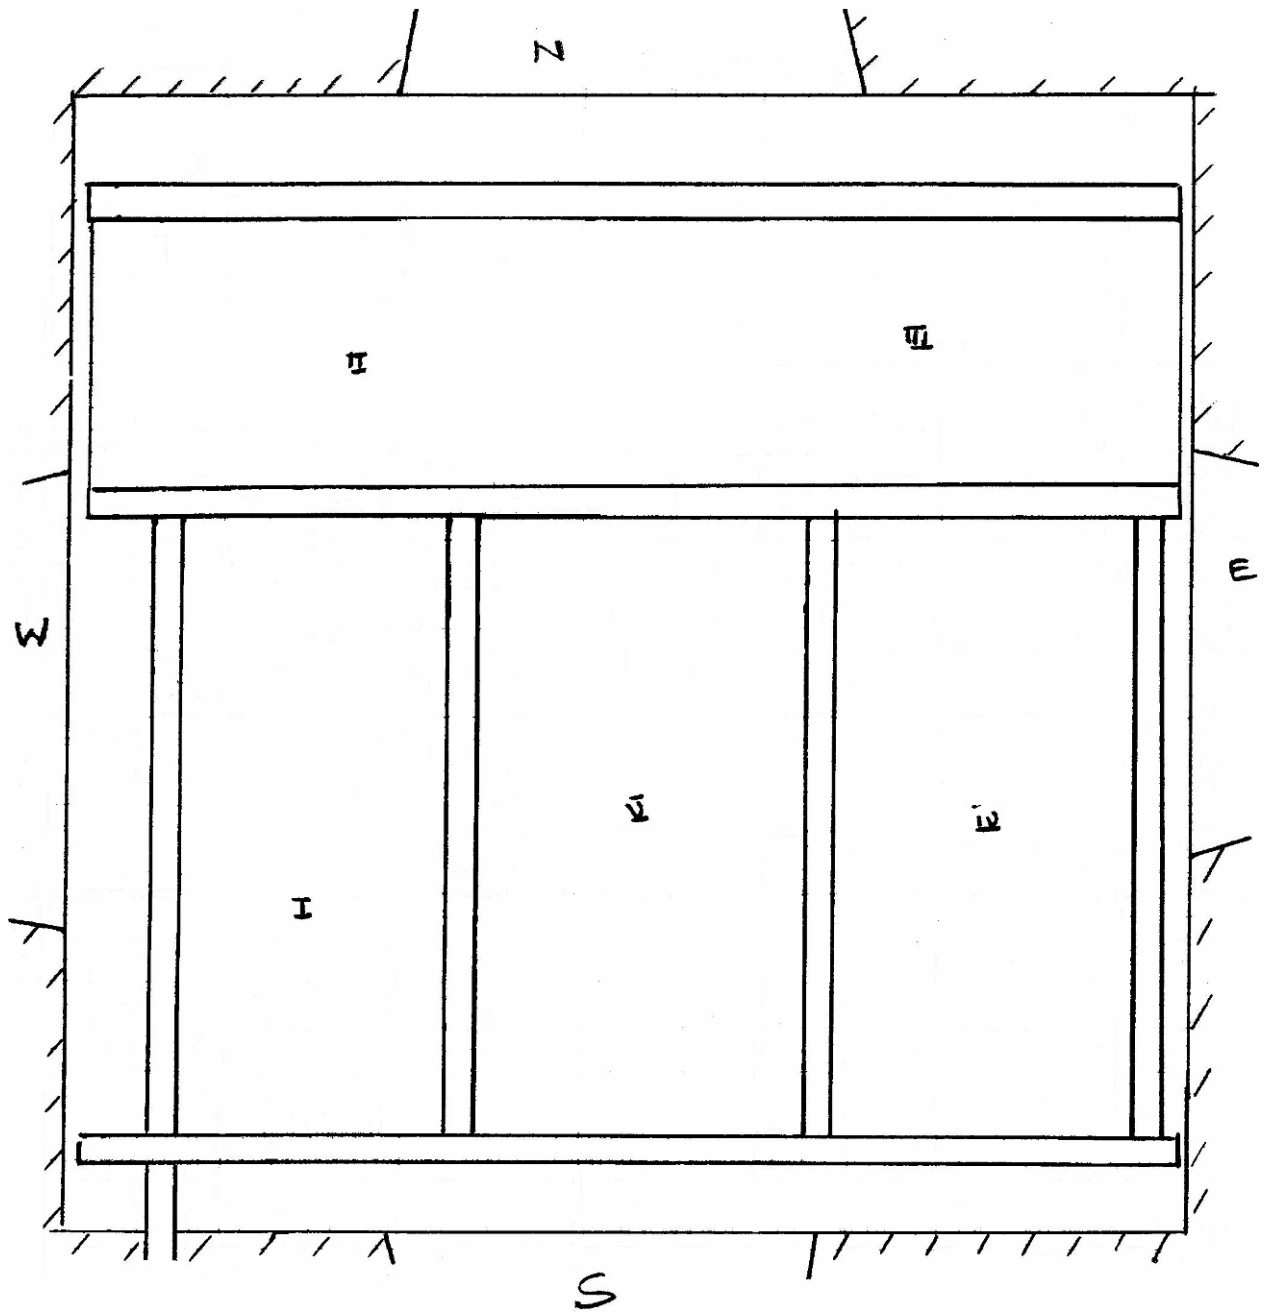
Thurlby Church; tower plan (provided by George Dawson)
